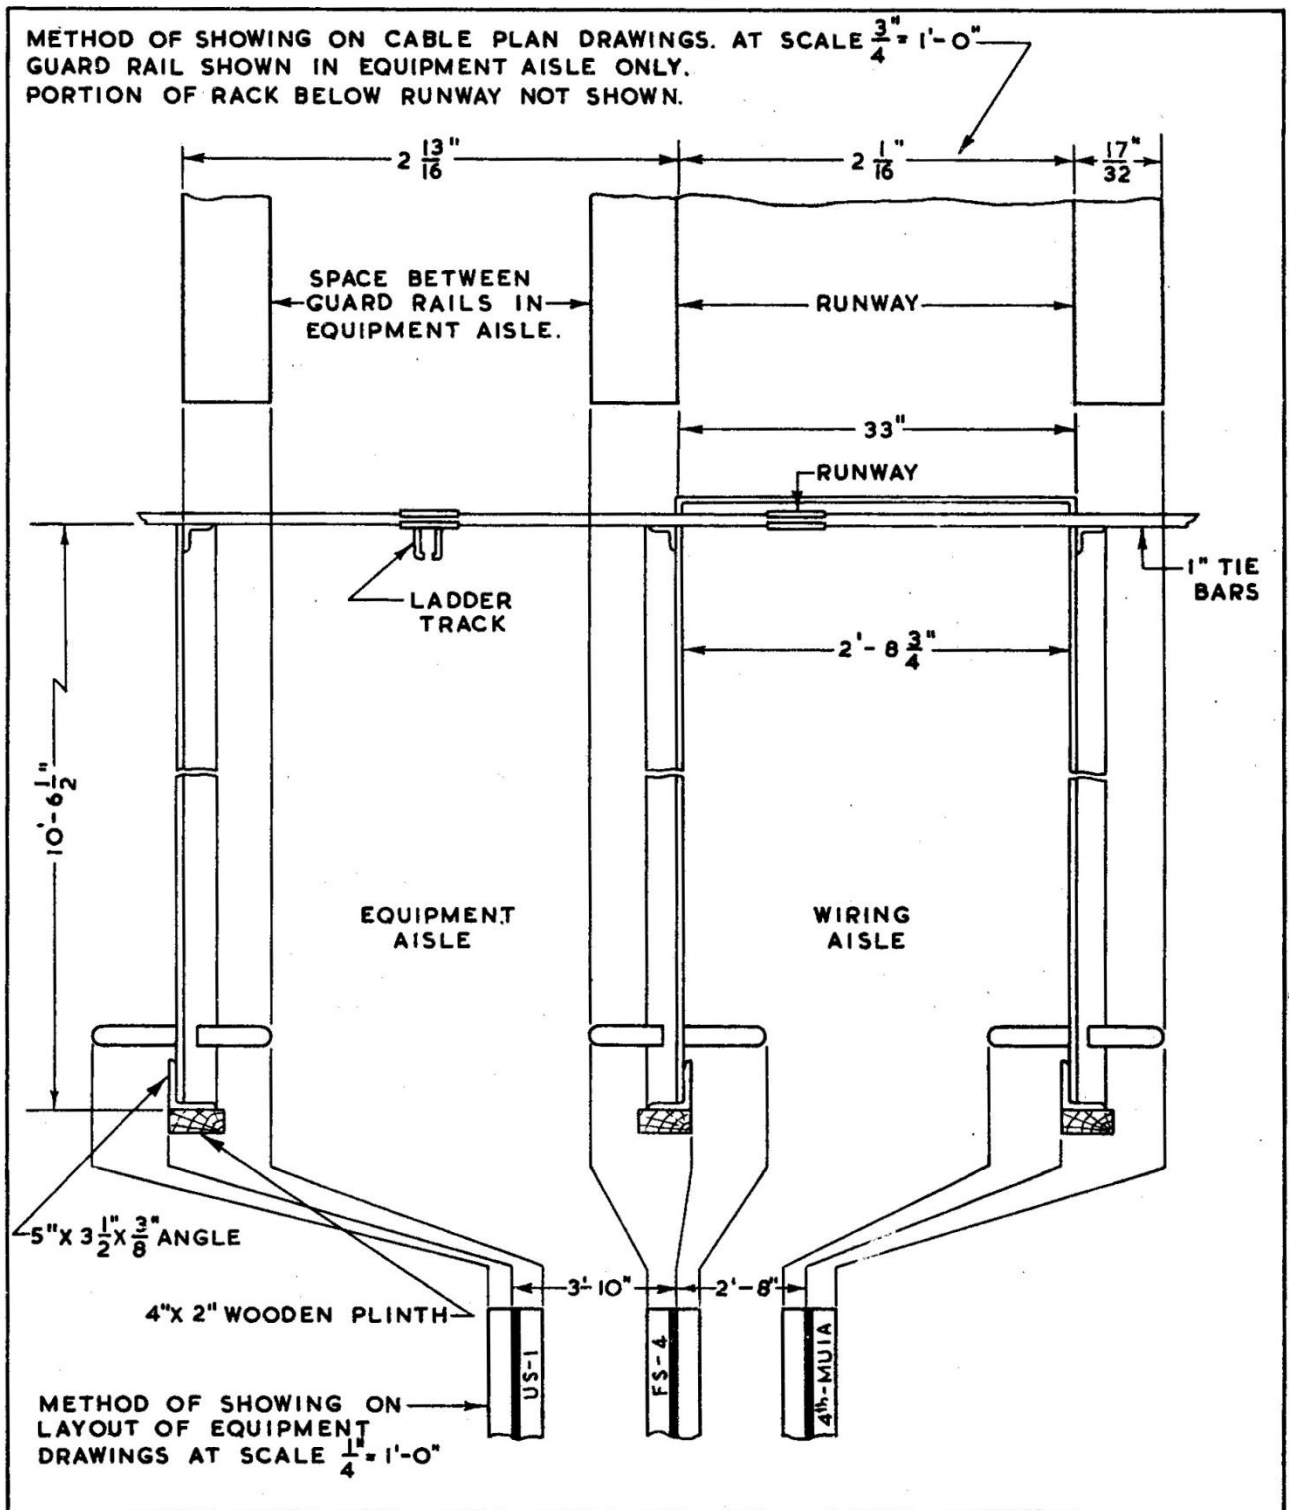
2000 TYPE EQUIPMENT. METHOD OF SHOWING RACKS ON LAYOUT OF EQUIPMENT AND CABLE PLAN DRAWINGS.
